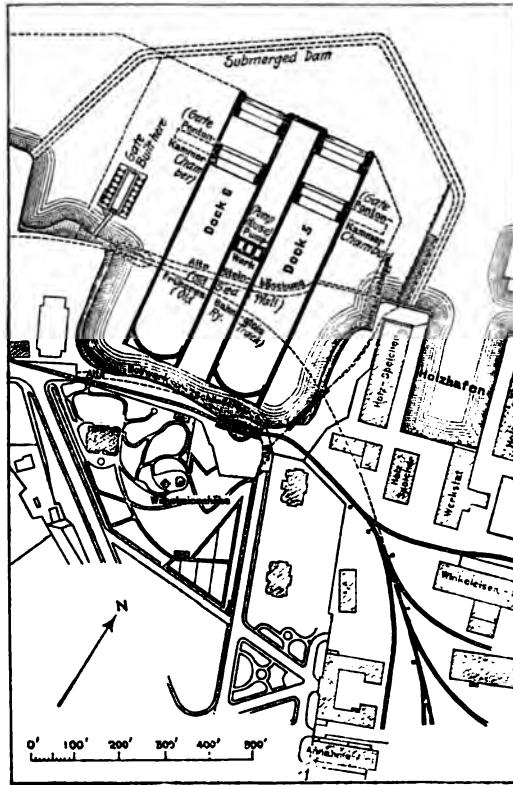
LOCATION PLAN OF NEW CONCRETE DRY-DOCK AT KIEL, GERMANY.
